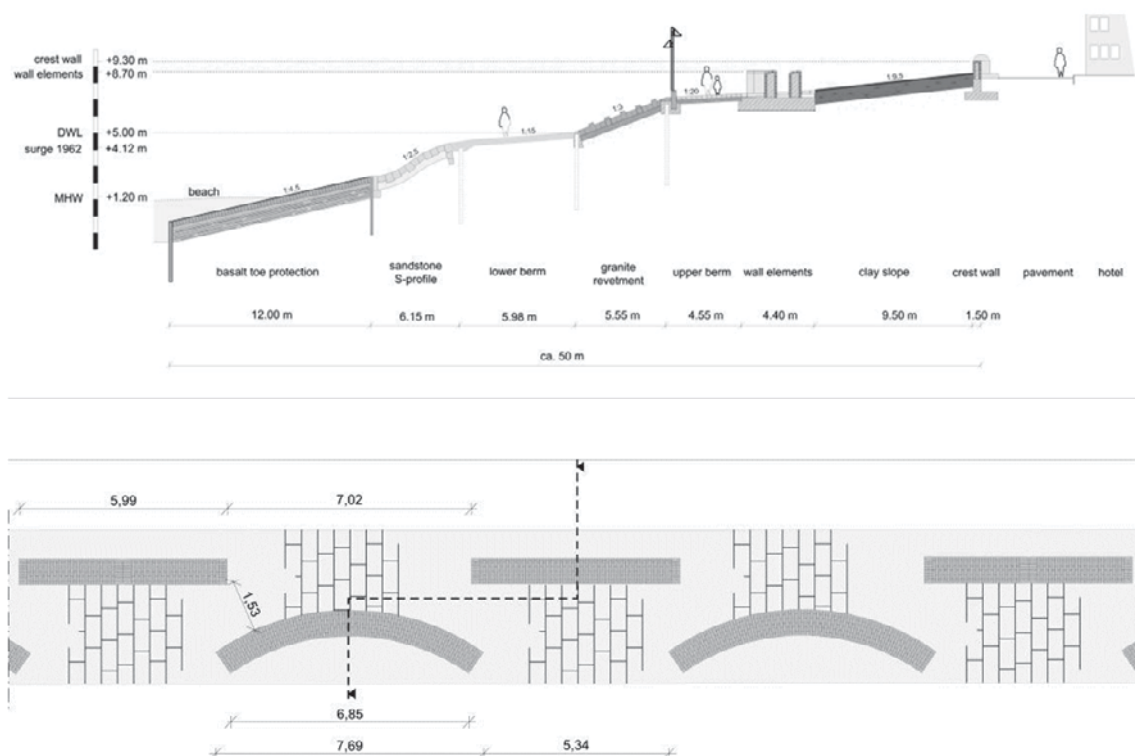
/b: Cross section and site plan location “Georgshöhe”
